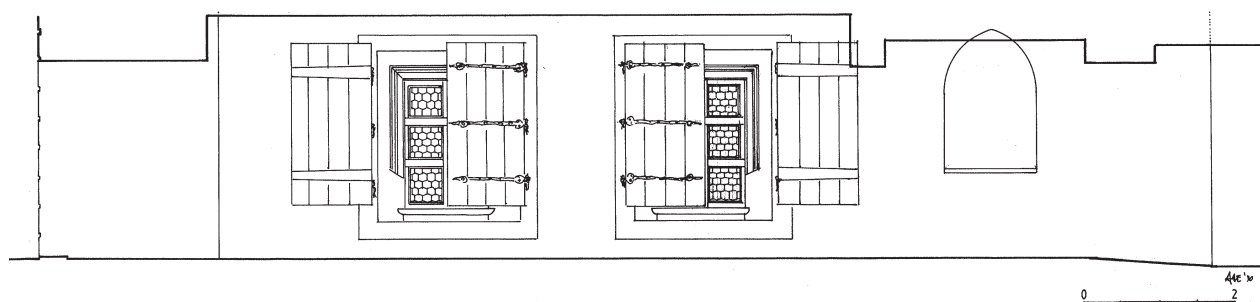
Reconstruction of a part of the ground floor in the south elevation after remodeling in 1547 (by A. Legendziewicz)
